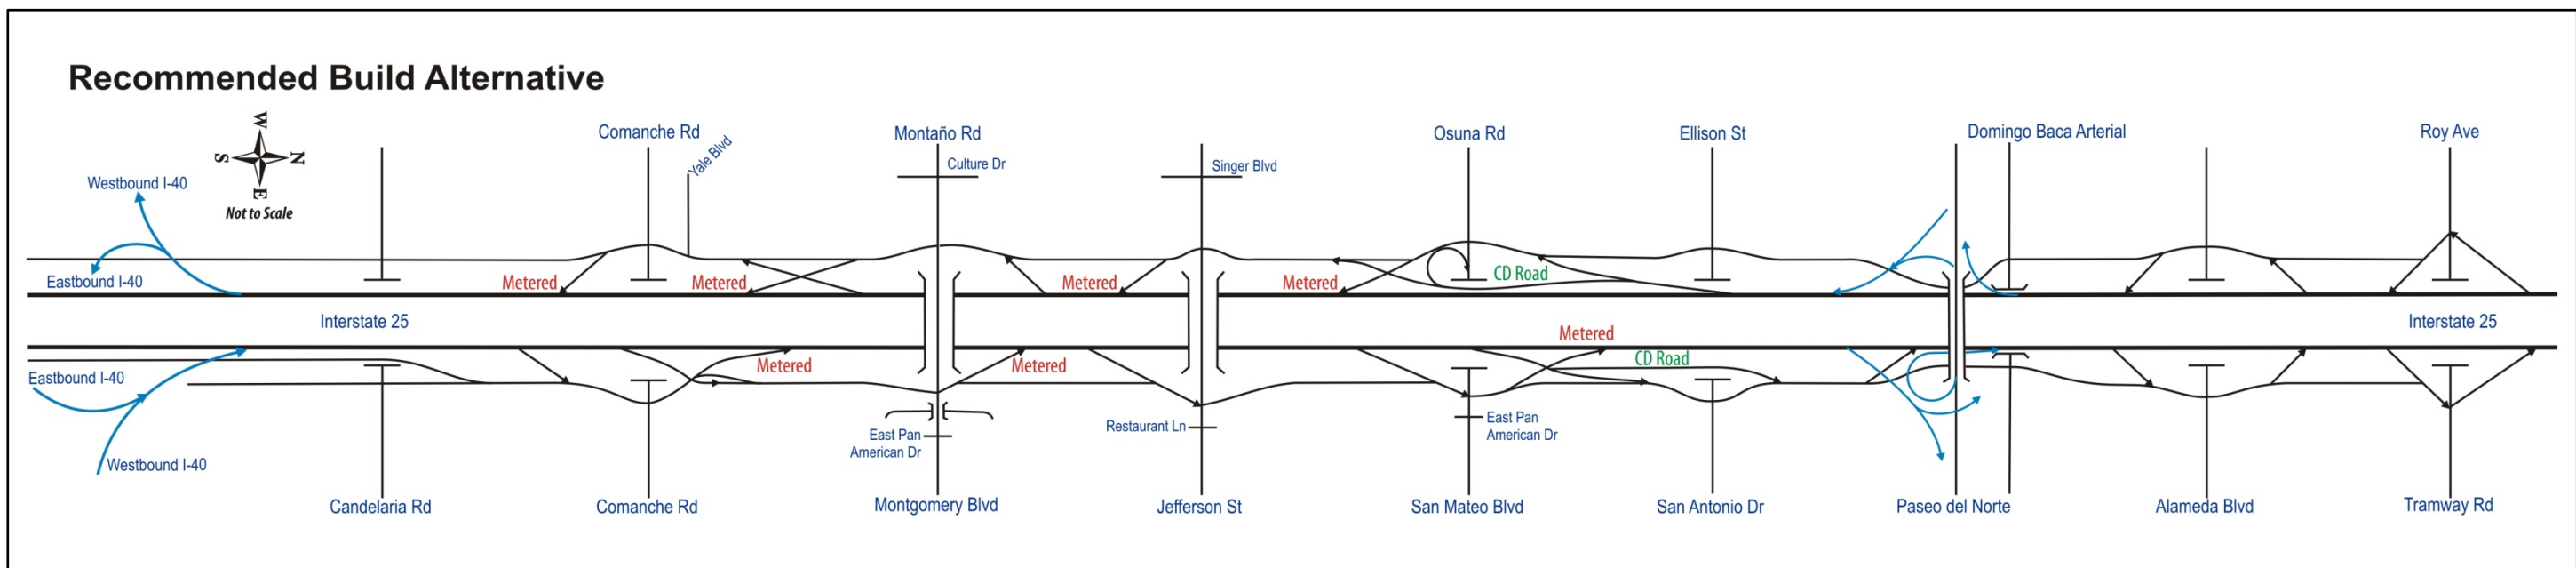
, Ramp Layout Schematic for the Recommended Build Alternative
